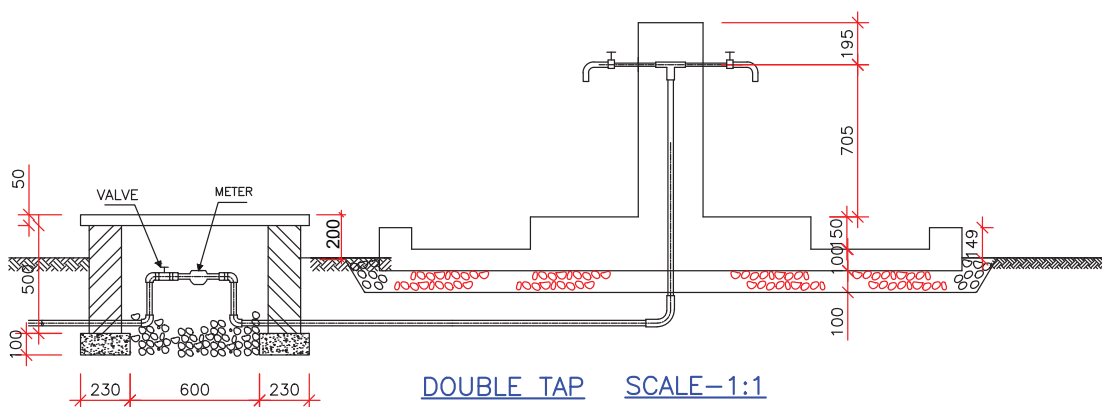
Typical Detail of a Double Tap Domestic Point
